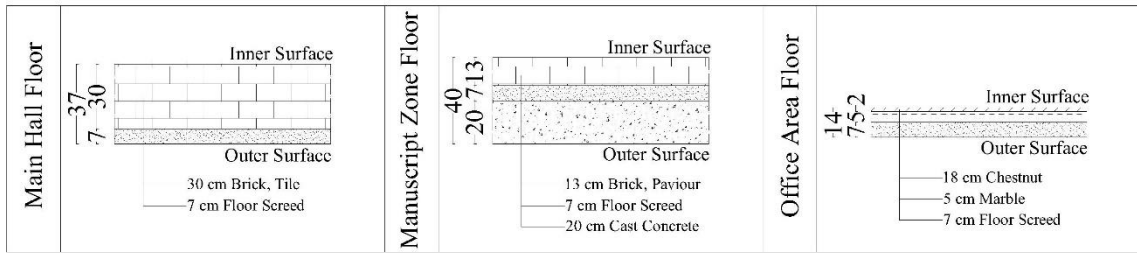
Sections of main hall, manuscript zone and office area floors
